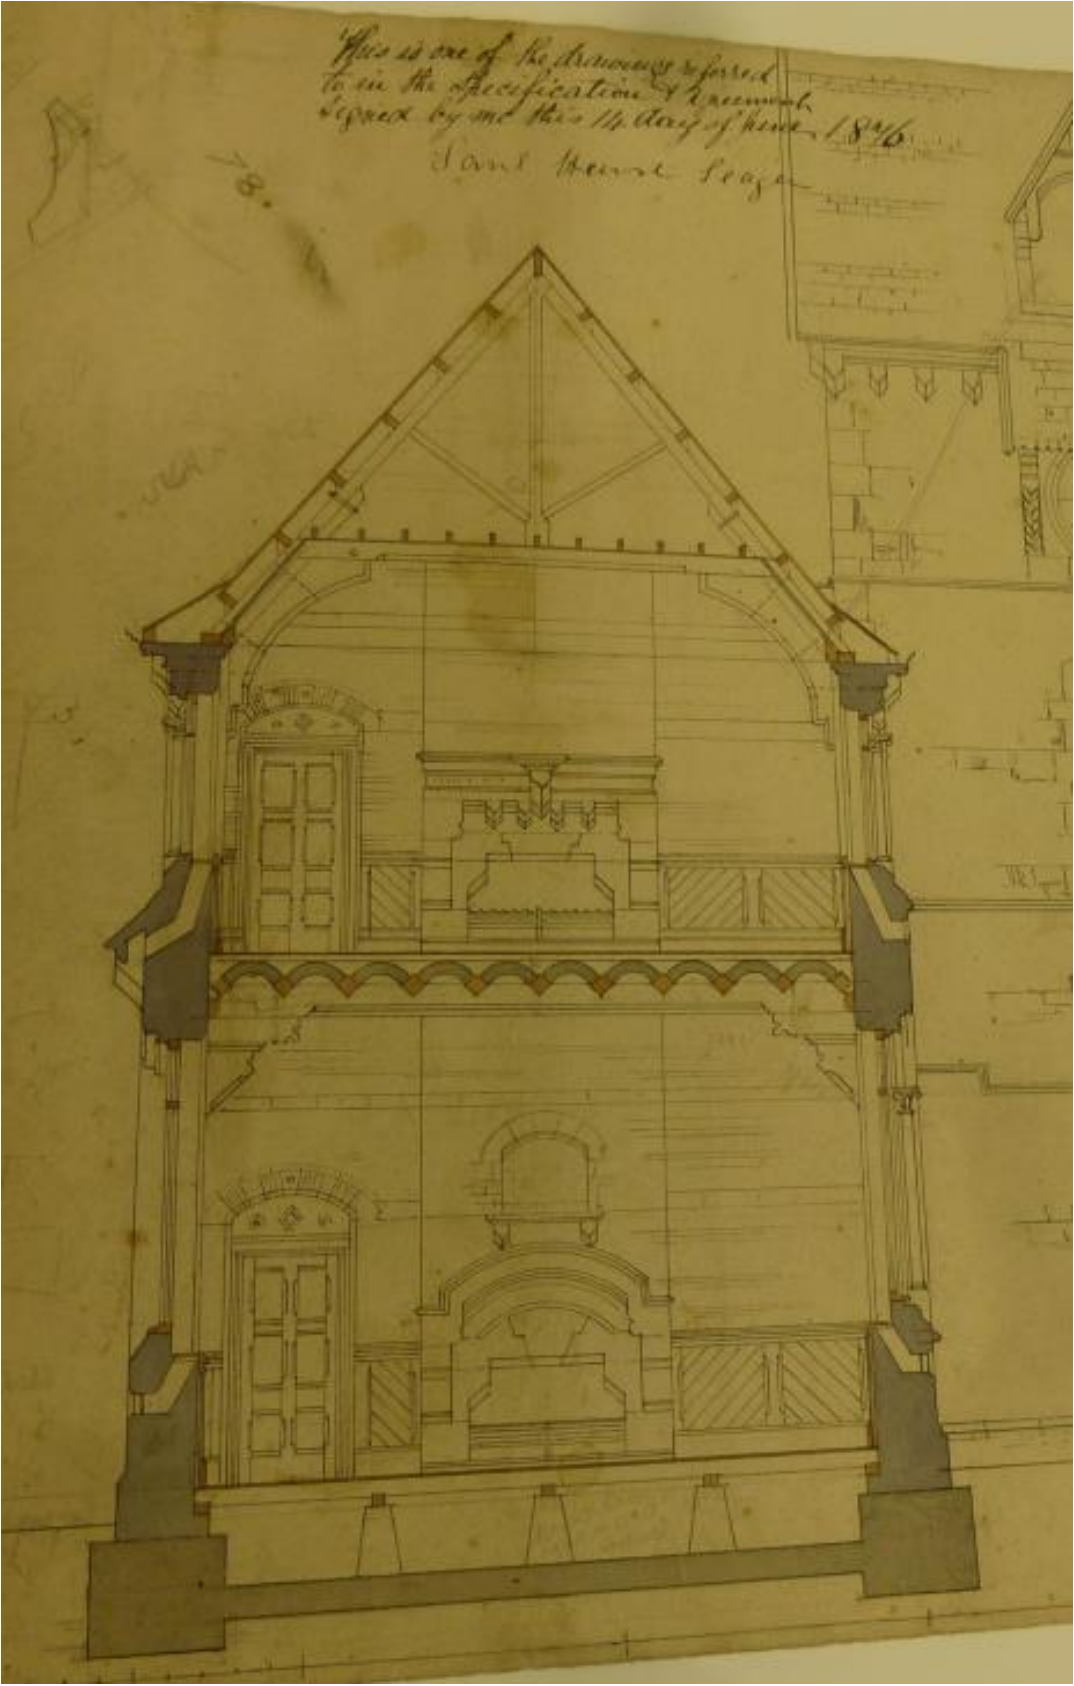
An original 1876 drawing of Canterbury College showing the arched ceiling panels made from 50mm pre-fabricated concrete
